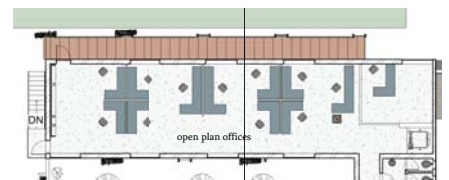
showing a portion of the upper floor plan of the office facing Main Street with similar daylight conditions to that of the ground floor (Author 2012)
